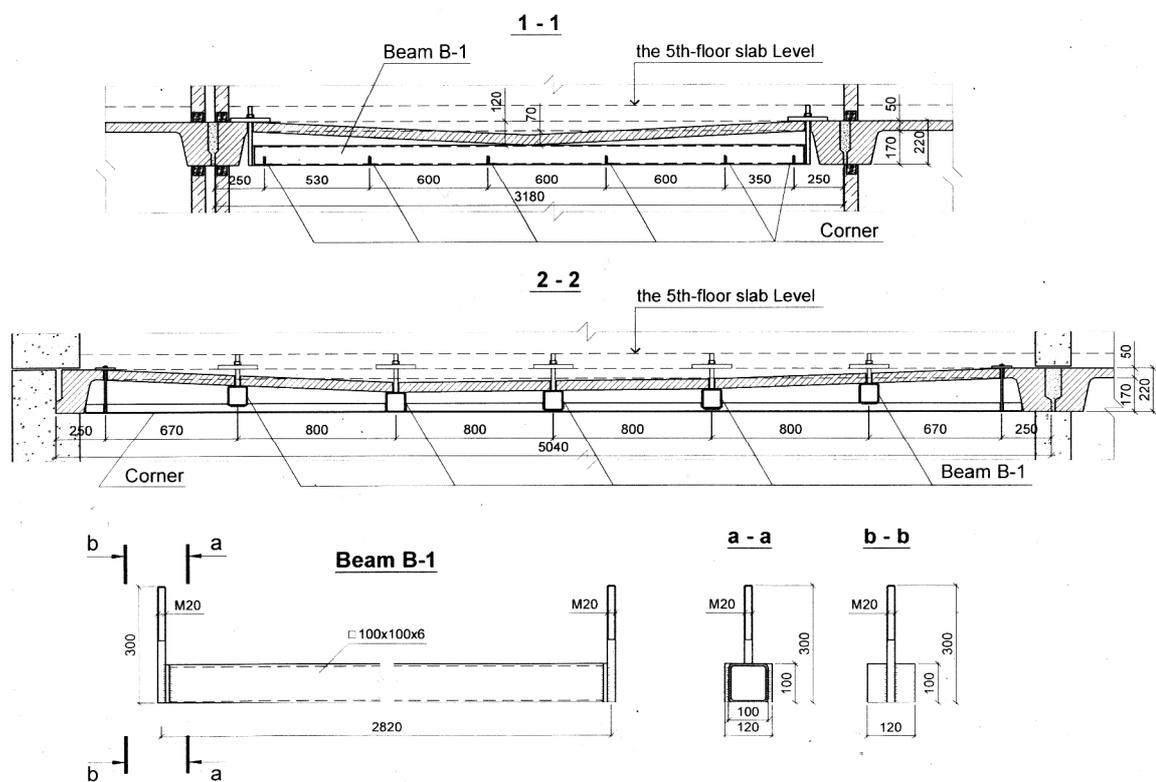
The construction of the reinforcement of the floor slab raised panel. Sections
